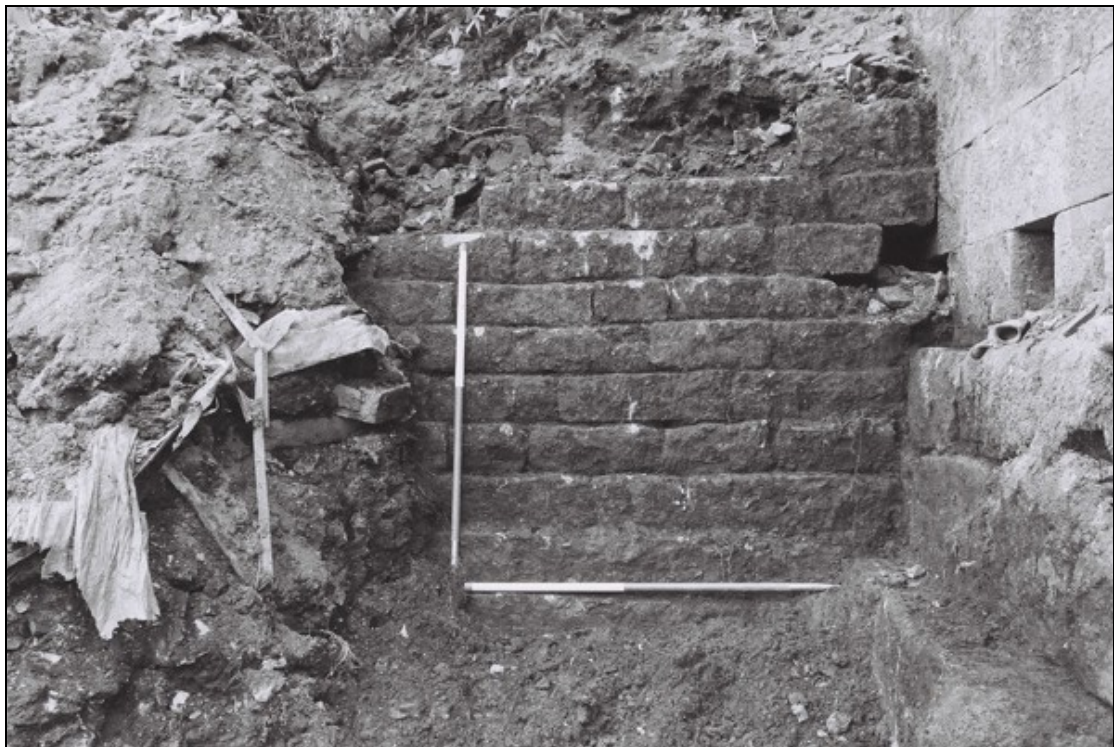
Eastern end of embankment retaining wall (film 1:4)
